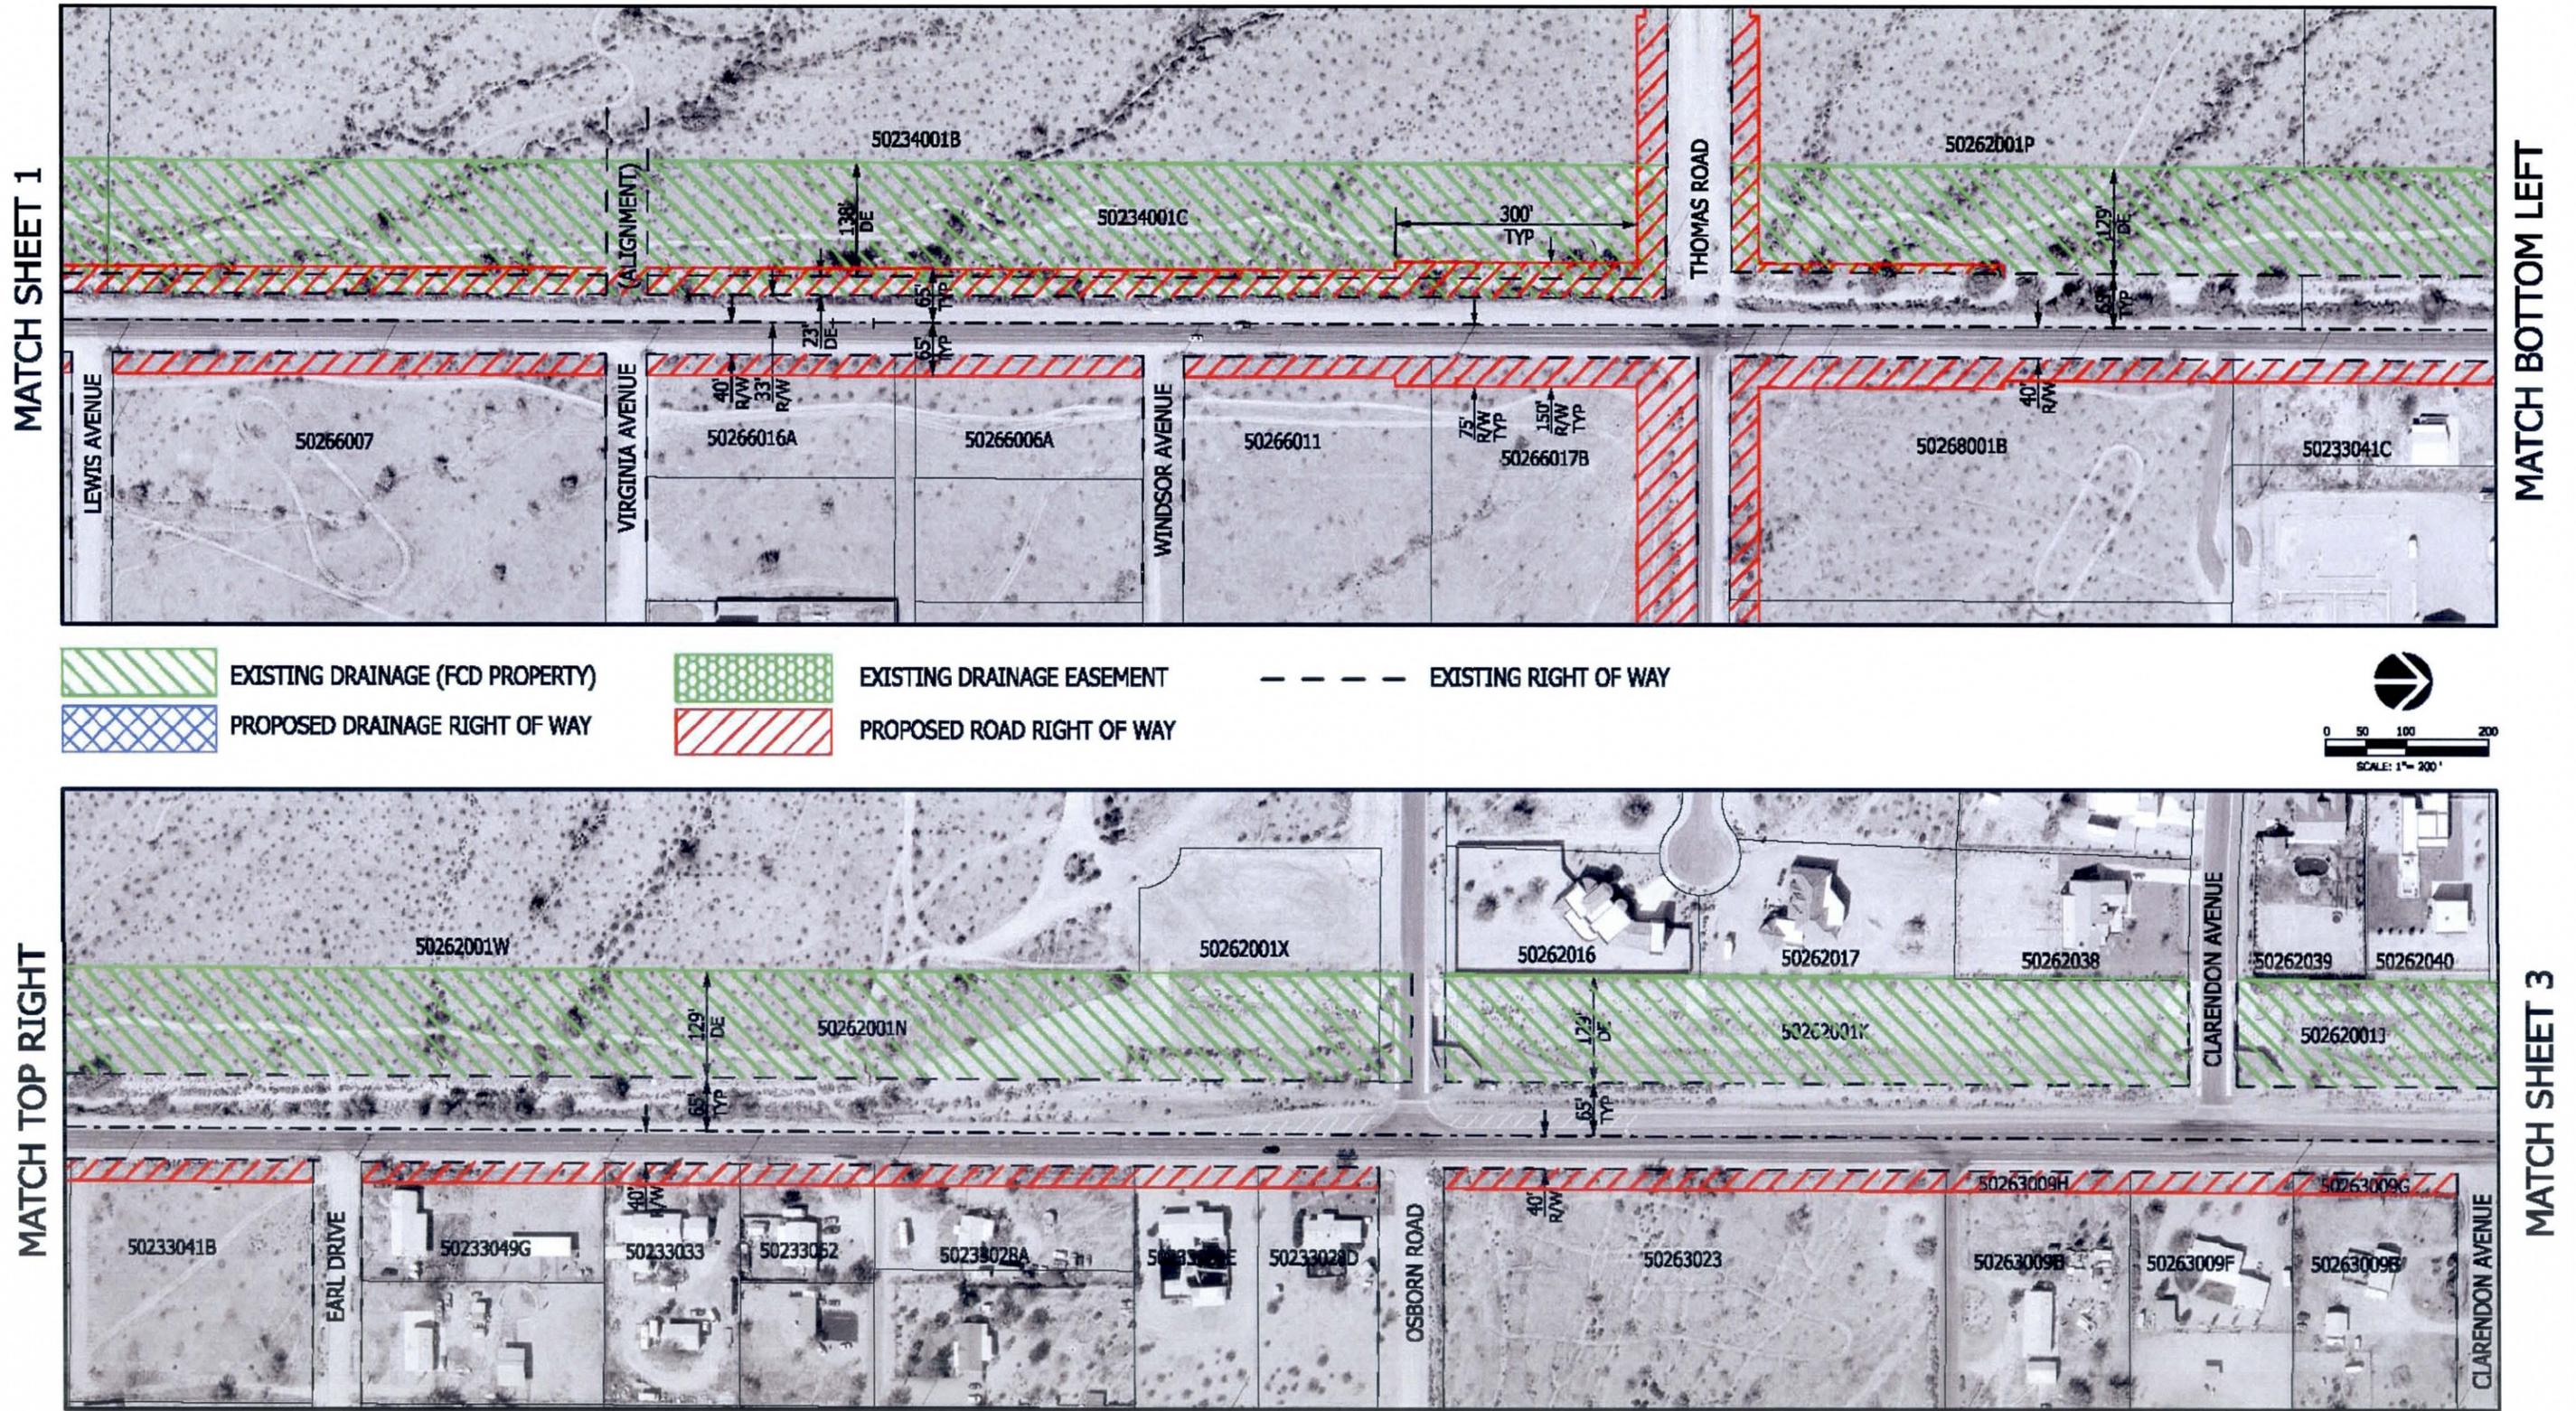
B – EXISTING AND PROPOSED RIGHT-OF-WAY, 2 OF 4
